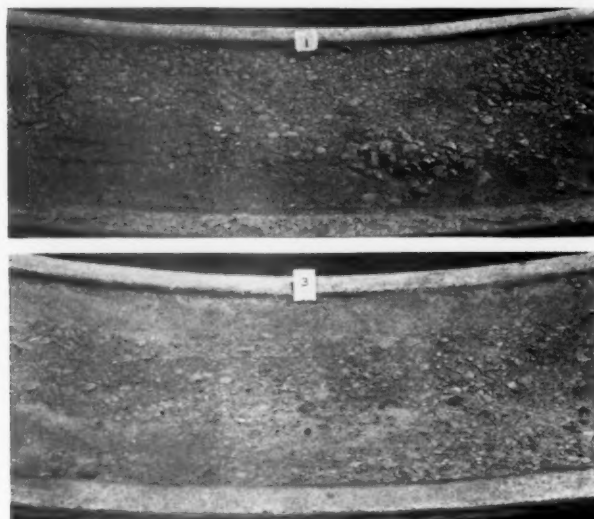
SECTIONS OF TRACK 3 AT 160,000 WHEEL-TRIPS, JUST BEFORE THE FIRST SPRINKLING. UPPER, SECTION 1, WHICH IS ALSO REPRESENTATIVE OF SECTION 2; LOWER, SECTION 3. SECTIONS 4 AND 5 WERE IN SLIGHTLY BETTER CONDITION THAN SECTION 3.
